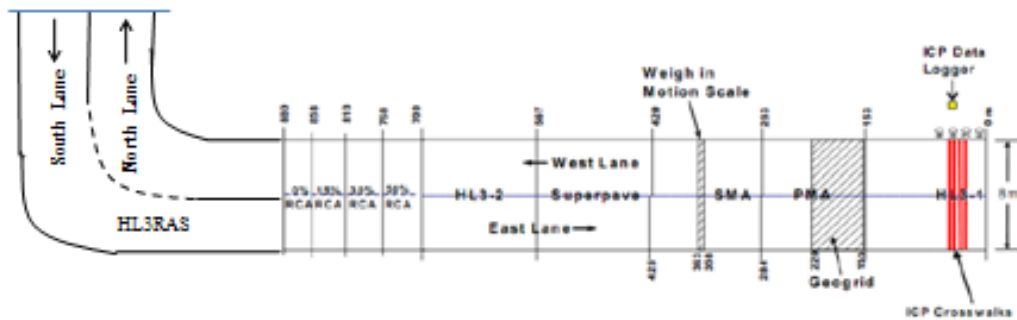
Flexible Pavement Portion of the CPATT Test Track after [UI-Islam, 2010]
